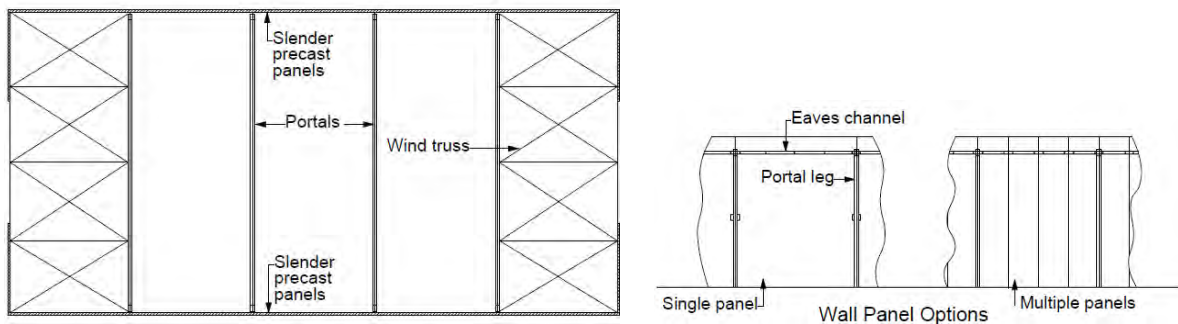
A typical plan and common wall options of industrial building (BRANZ)
